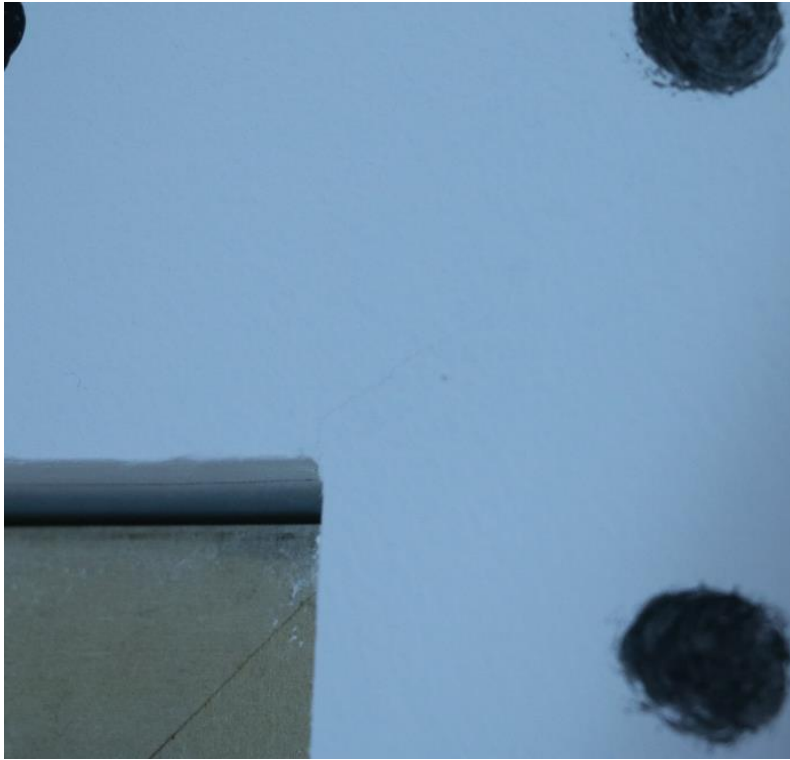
Specimen A3 – Prior to test start– DS0: hairline paint cracking at the corner of door frame - location 13
